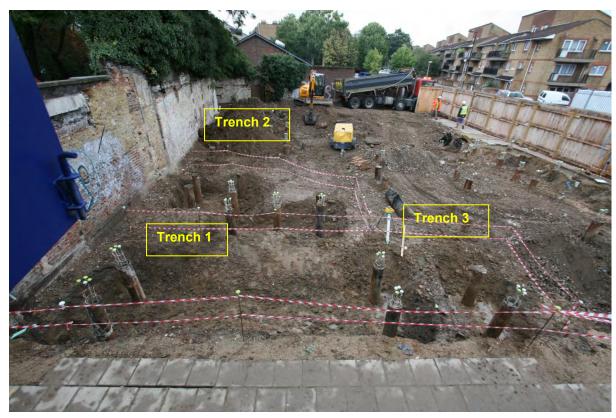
General view of the site showing Trenches 1 to 3 on the 11th October 2013, looking north (QUE13 D1 (9))
